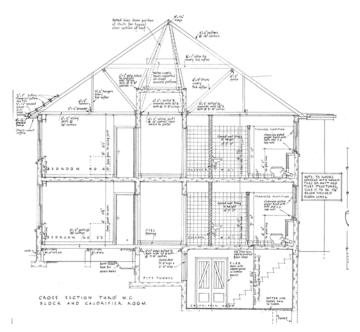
1955 Construction –Building Section at Water Tank / Partial Basement
